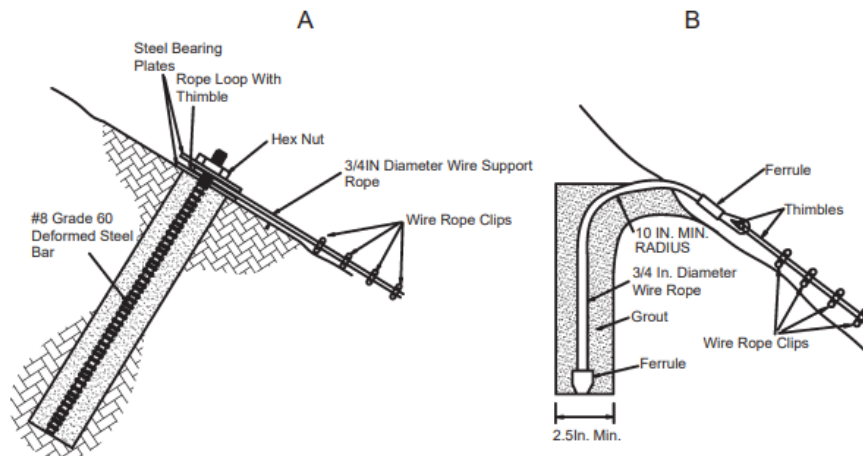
Comparison of a standard rock bolt and a wire rope grouted rock anchor
